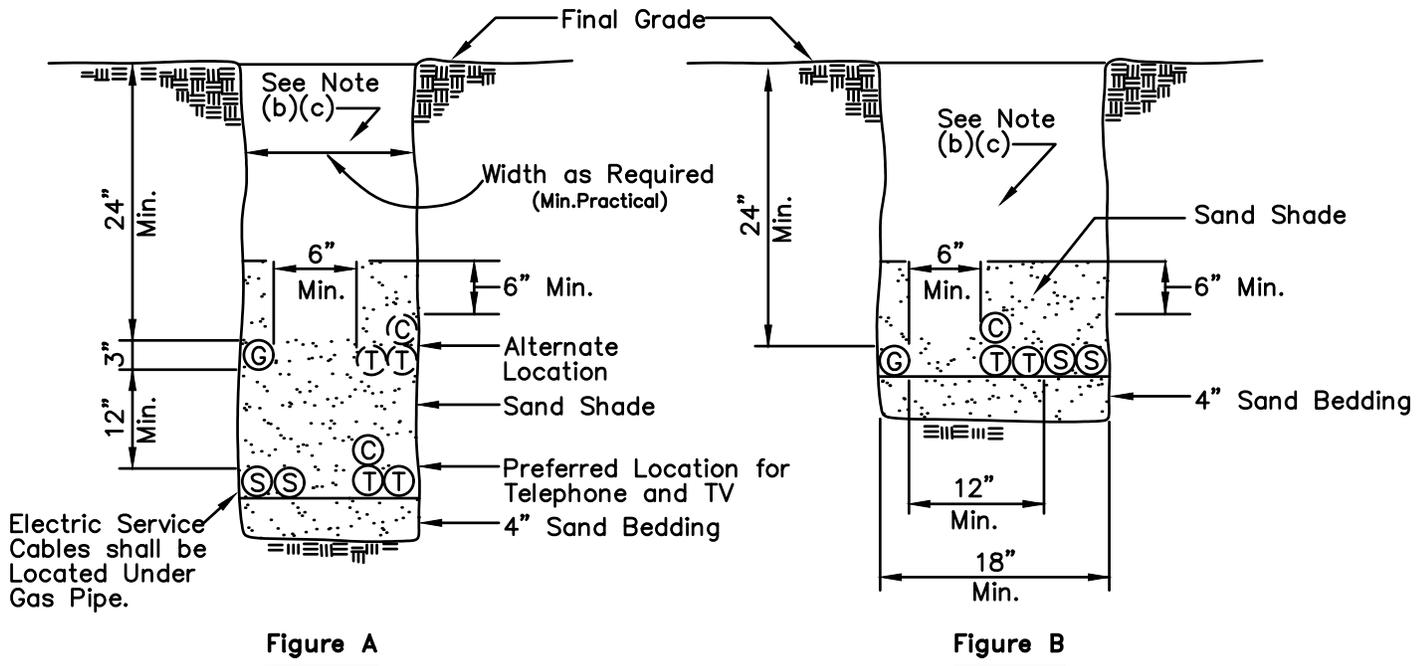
TYPICAL SERVICE TRENCH DESIGN
